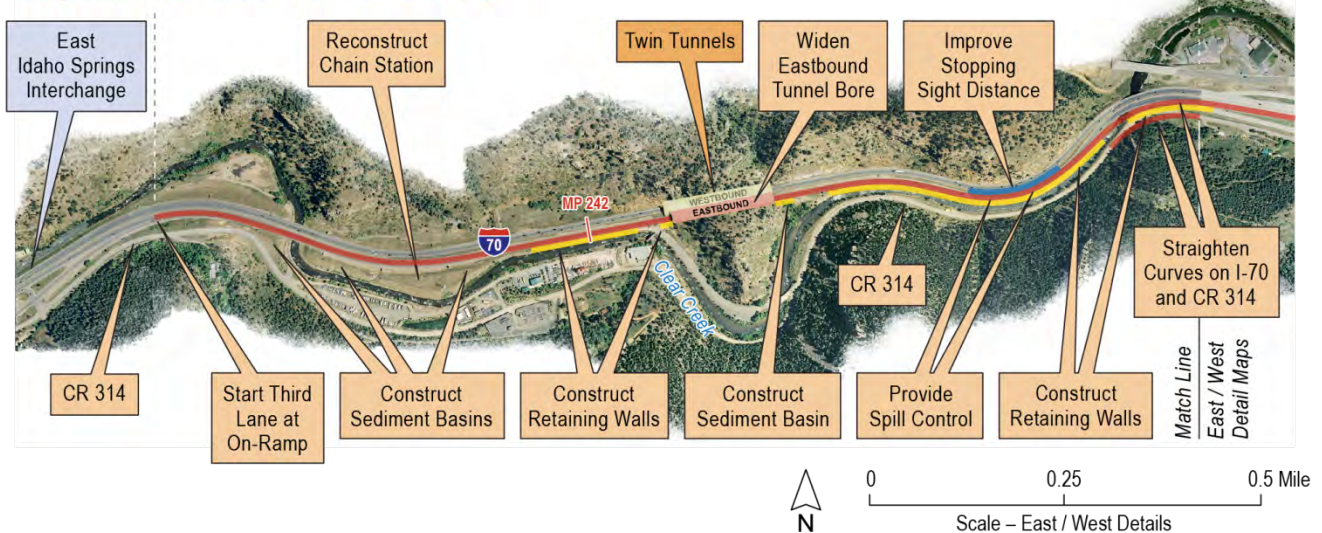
Twin Tunnels Proposed Action - Overview and Detail Maps
